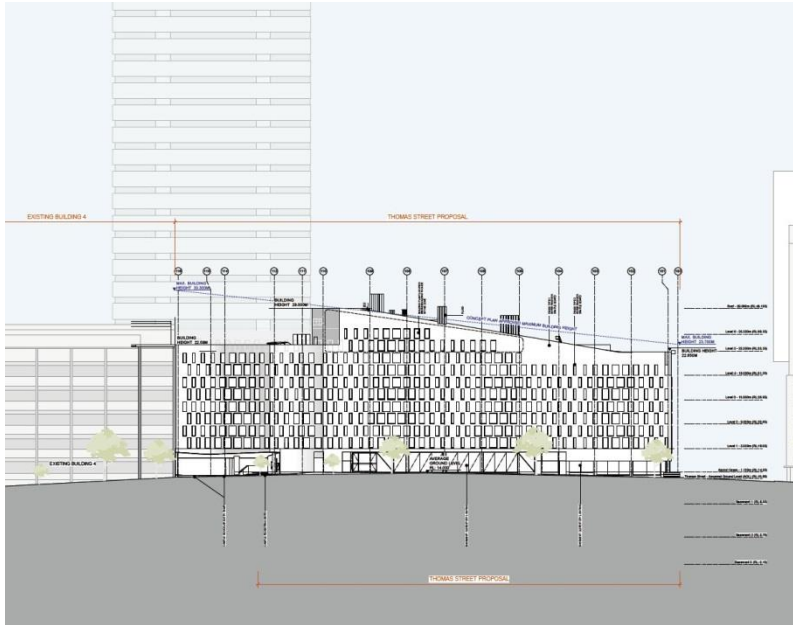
Building height – Thomas Street (north) elevation (Source: DBJ+BVN)
